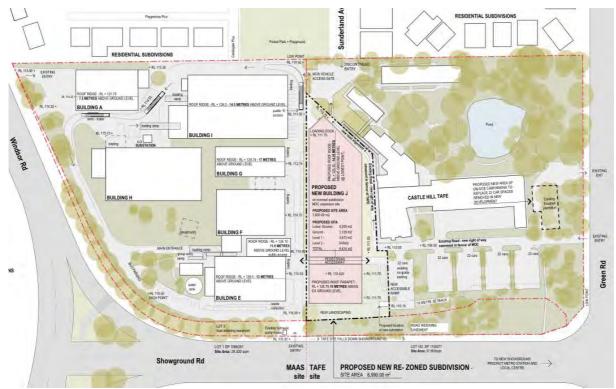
Proposed site layout plan Source: Lahznimmo Architects
